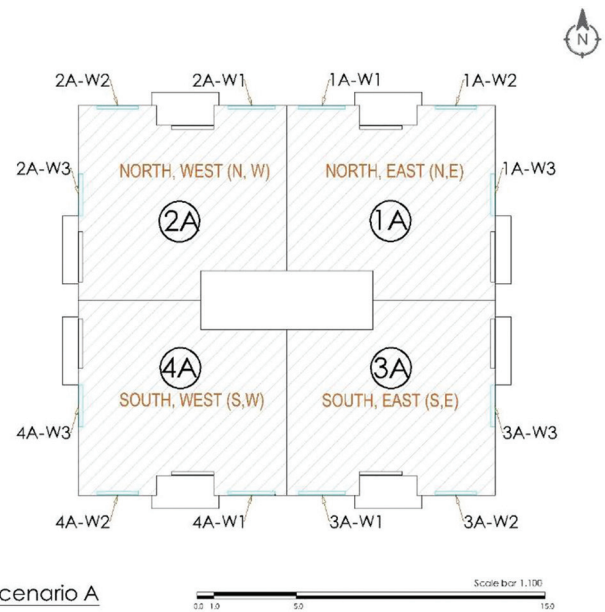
Scenario (A) case study real orientations (North, East, South, and West) – Plan (Source: Author).
